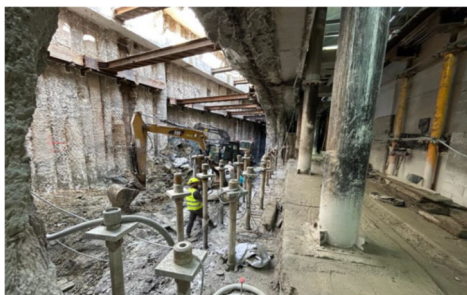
View of the micropiles tubes over the existing Terminus not demolished wall alignment.
